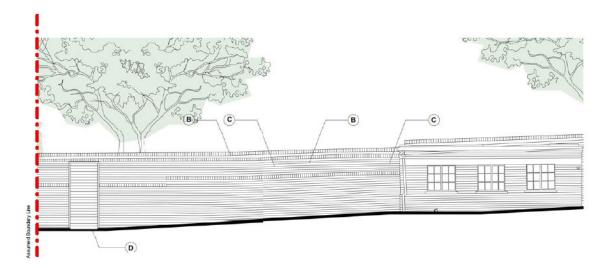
Proposed rear elevation as viewed from No. 20 Perrin's Walk
